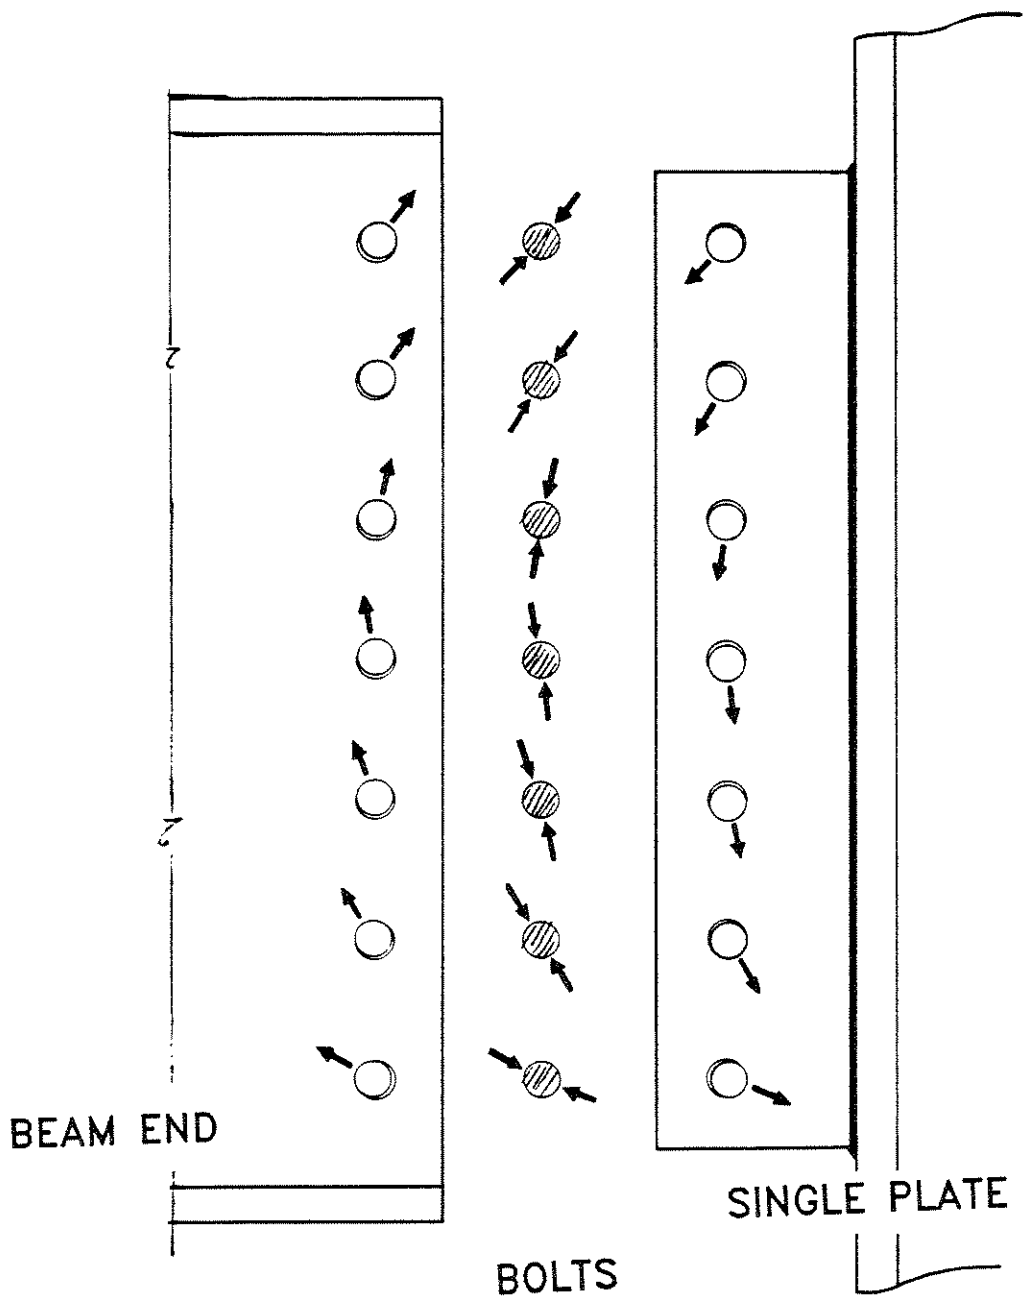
(a) Bolt Hole Deformations in Specimen 1
